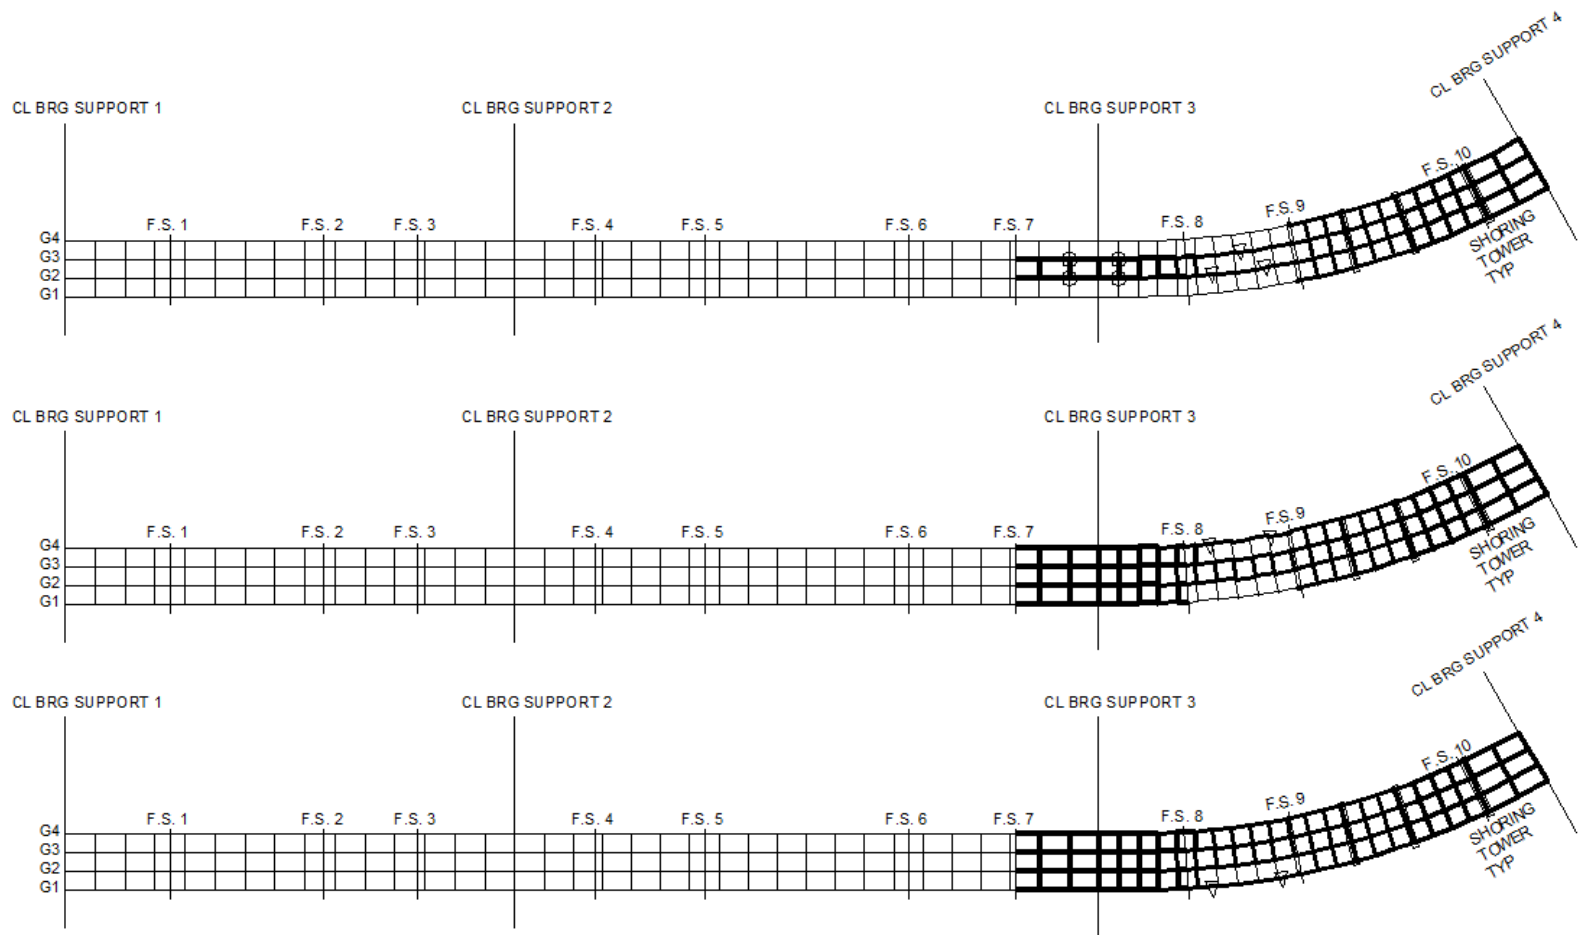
Erection stages involving field splice connections of drop-in segments in bridge (E) EICCR11.
